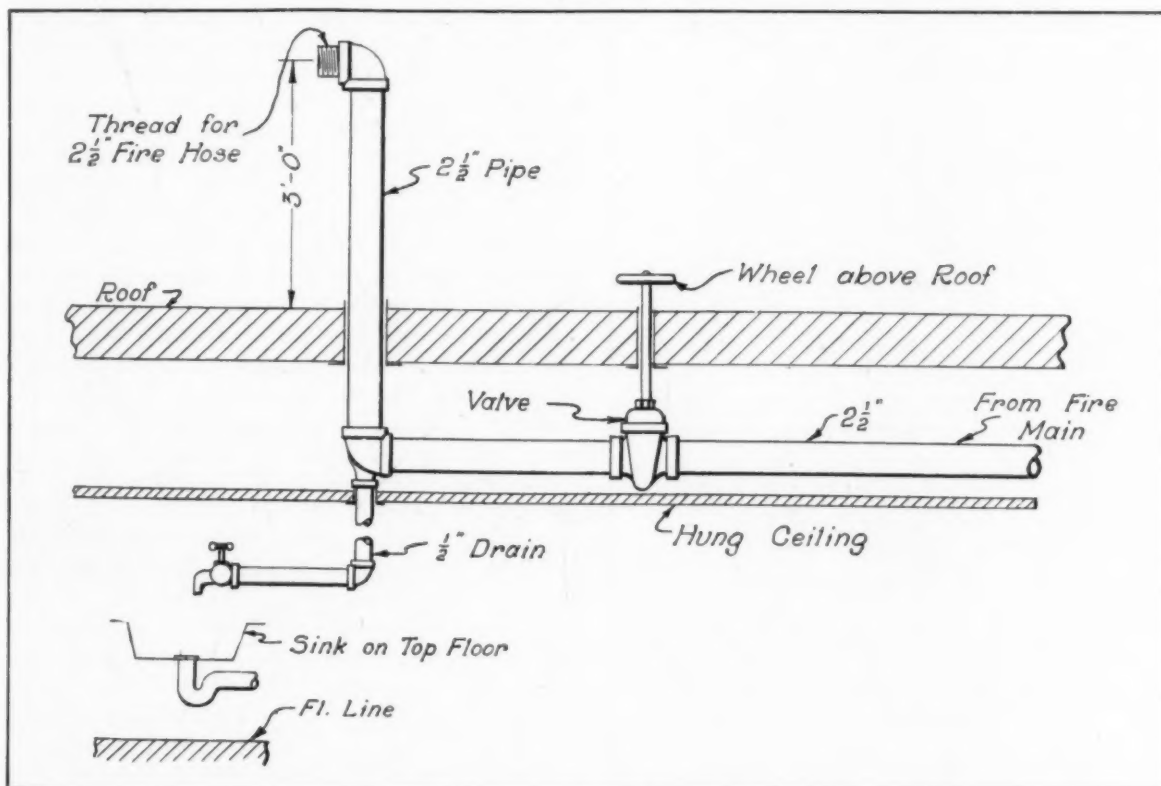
Detail of Typical Roof Outlet, Valve and Drain
